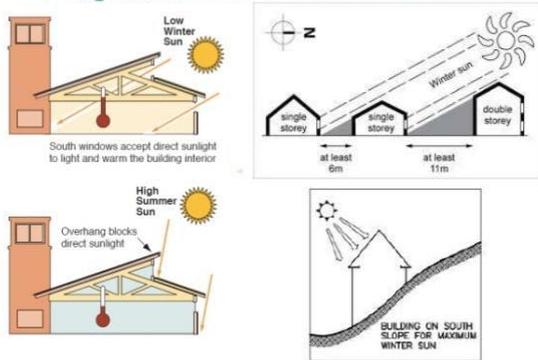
South facing glazed windows admits direct sunlight to light and warm the building interior.
